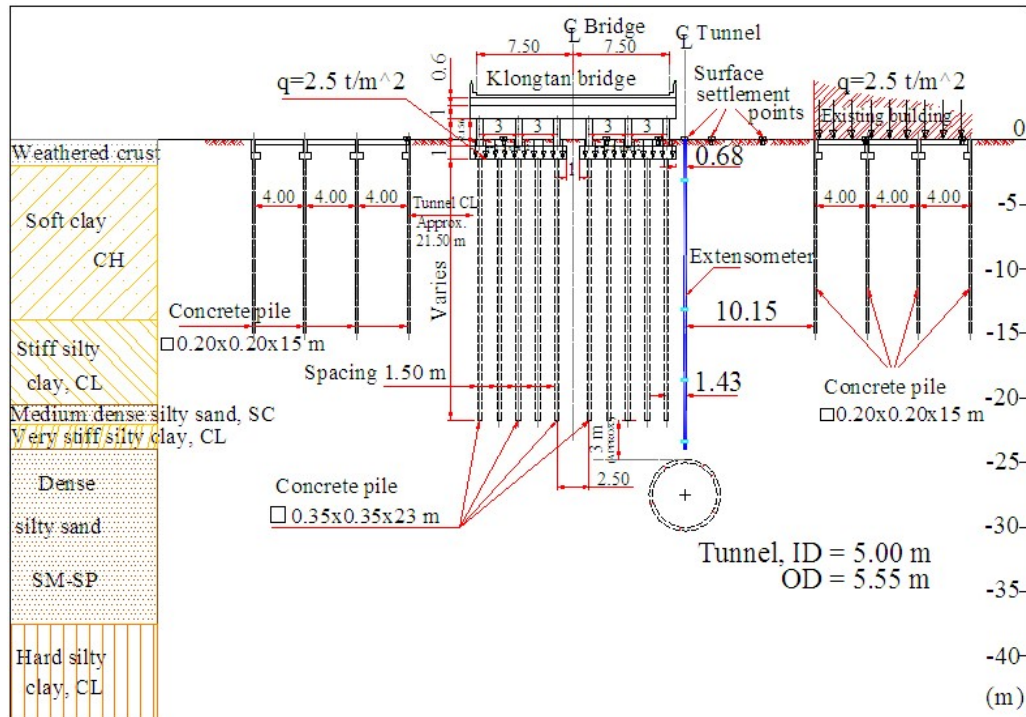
Subsoil profile at Klongtan Bridge area and cross section (section AA)
